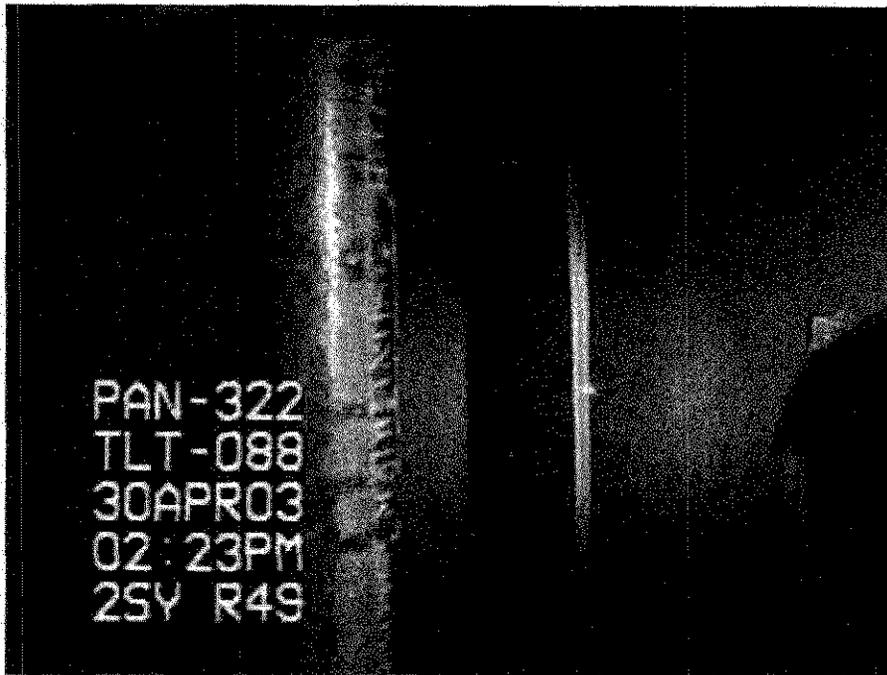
SY-102 Riser 49, Secondary Tank Wall (Right, 2003)
